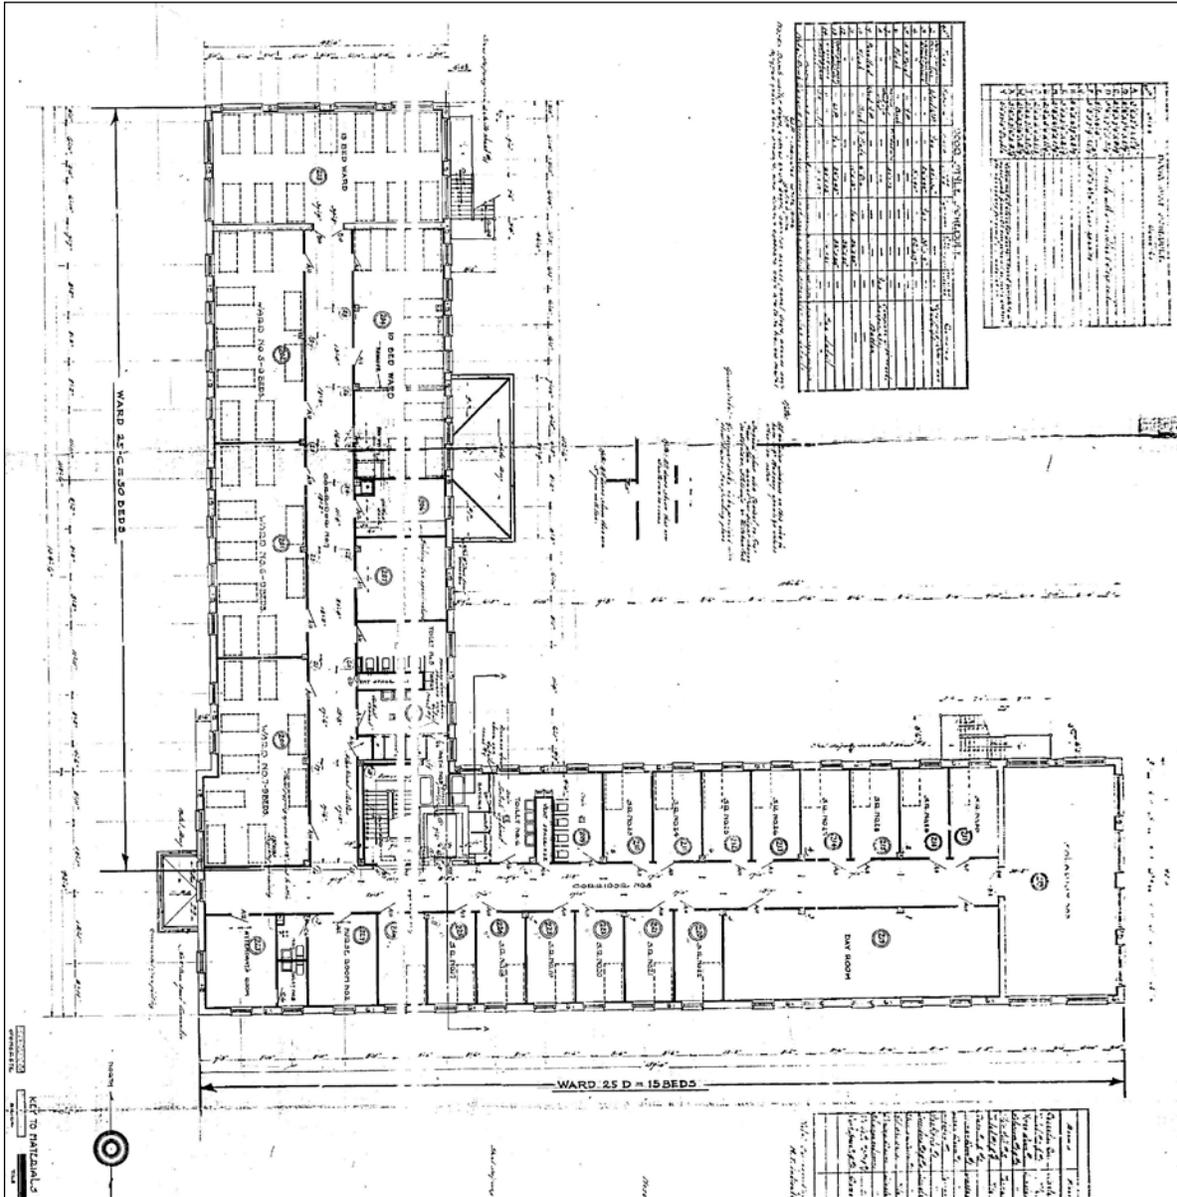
Second Floor Plan, Hospital Annex No. 2, A. M. Strauss, 1929
